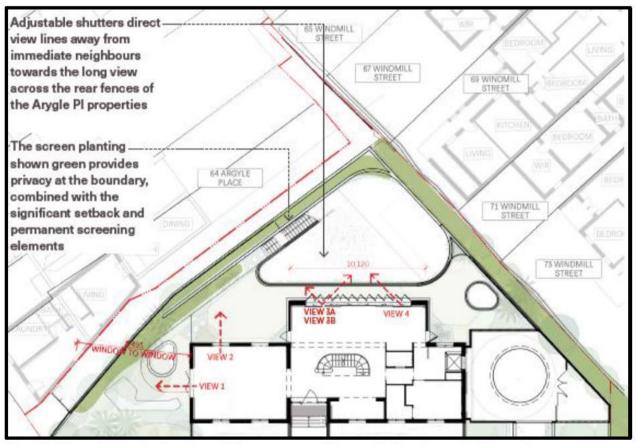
Privacy Impact Study - Ground Floor - proposed (Source: Andrew Burns Architecture)
